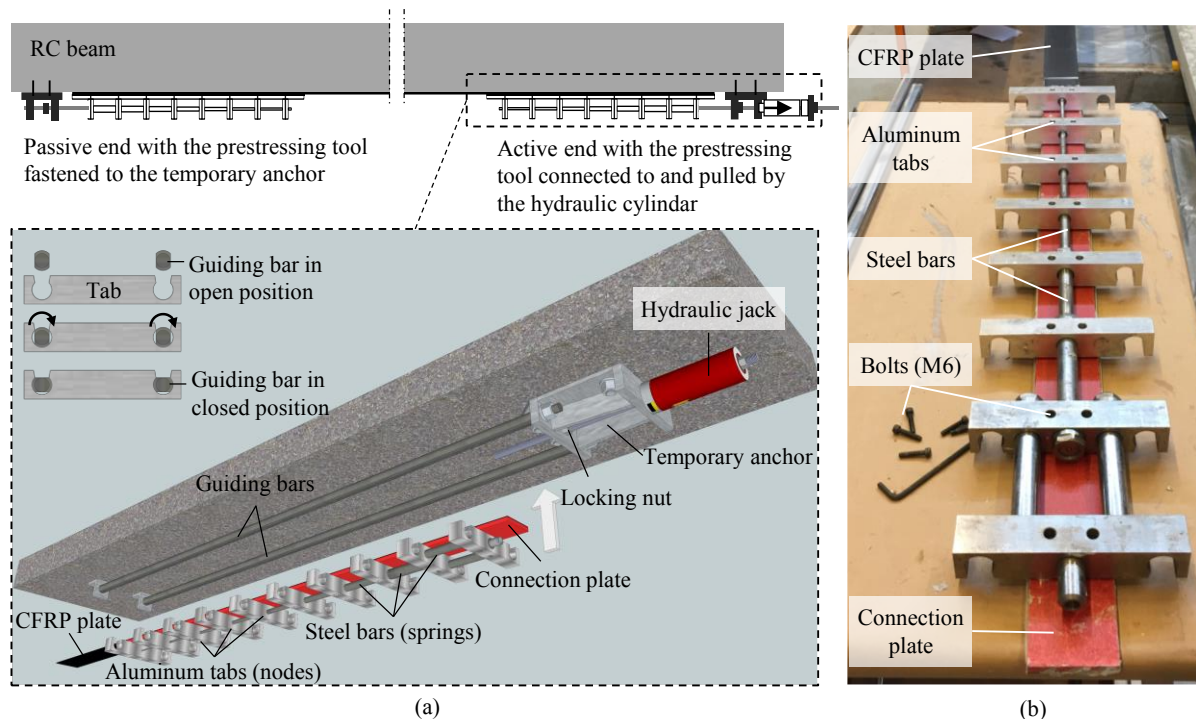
(a) Apply a prestressed CFRP plate to the soffit of an RC beam using the stepwise prestressing method; (b) mechanical prestressing tool as the critical component of the prestressing system.
